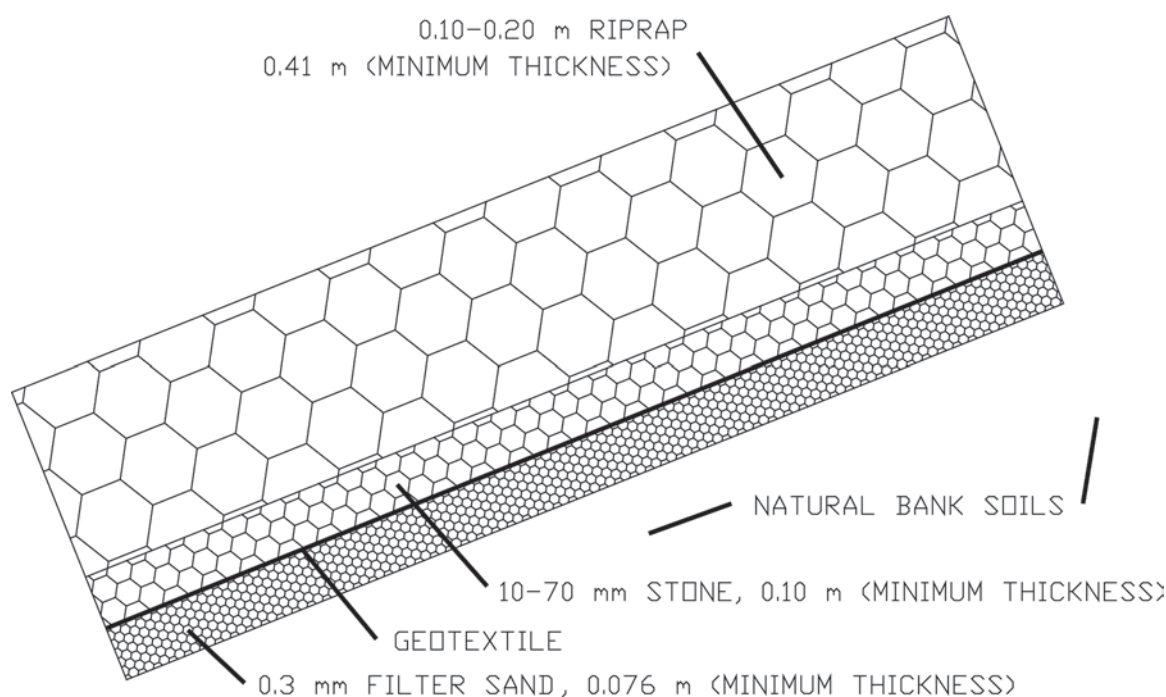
Minimum section recommended for Ohio River revetment to address seepage failure. Adapted from W.A. Cutter and R.C. Waterman unpublished manuscript November (1984).
